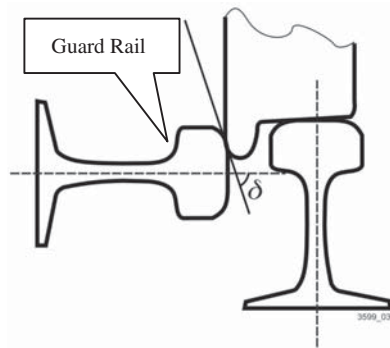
Wheel and horizontal guard/restraining rail installed at low position.
